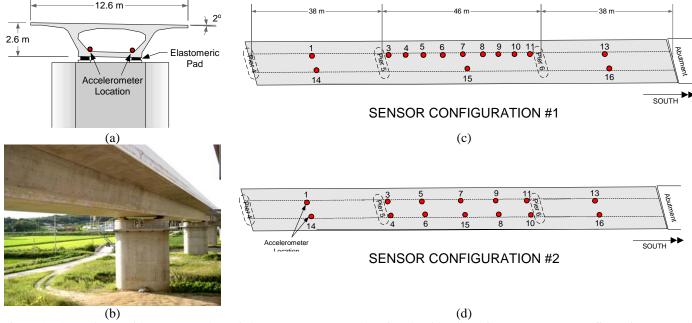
Geumdang Bridge concrete box girder span: a) structural section, b) side view picture, c) sensor configuration #1, and d) sensor configuration #2.
